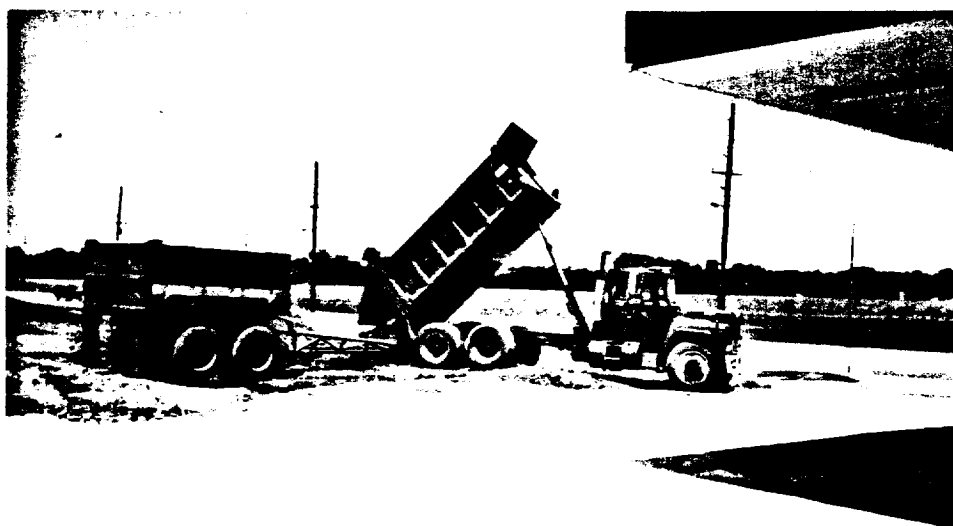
Tankhold with liner showing imported backfill being placed in tankhold.
